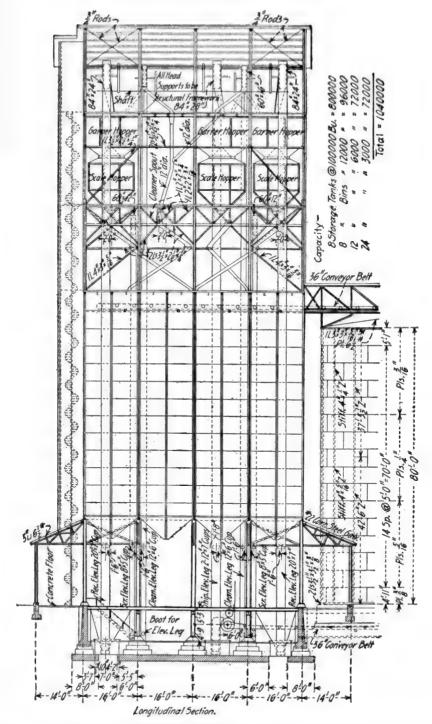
Longitudinal Section of Working House of Independent Elevator.
